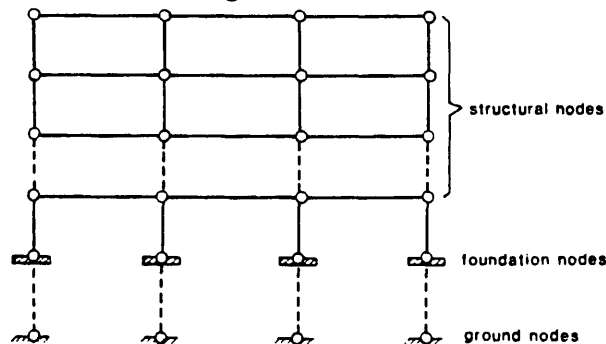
Settlement of a multi-bay multi-storey structure with single footing foundation (after Attewell et al., 1986).
